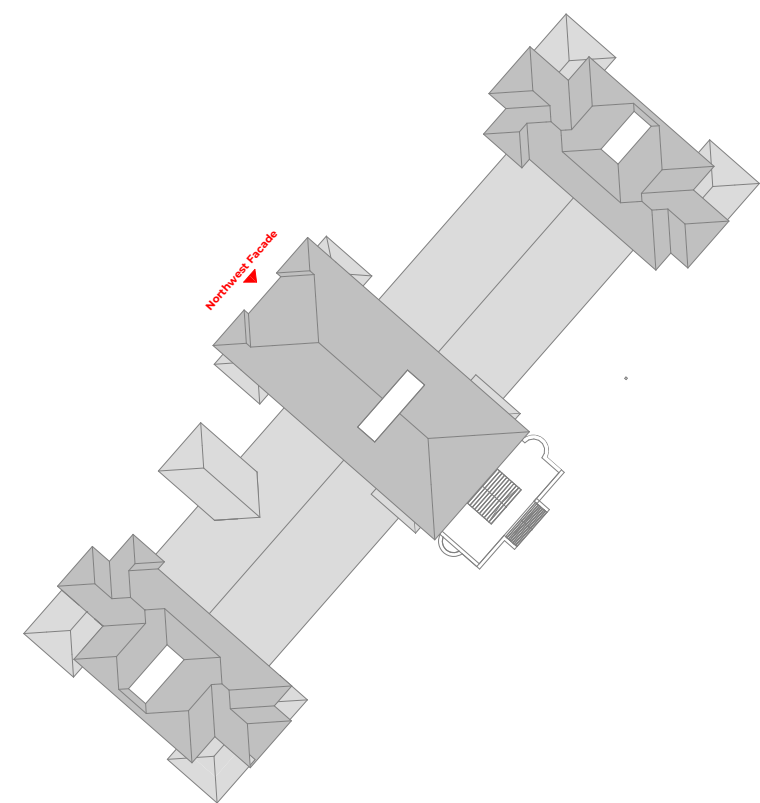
Roof Plan (Source: Created by the author, 2024)
